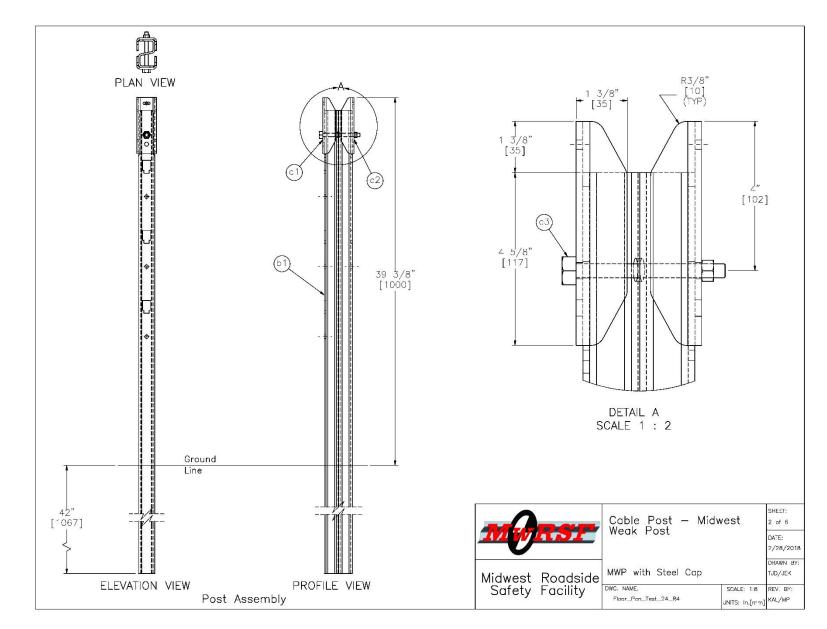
MWP with Steel Cap, Test No. MWPFP-24
